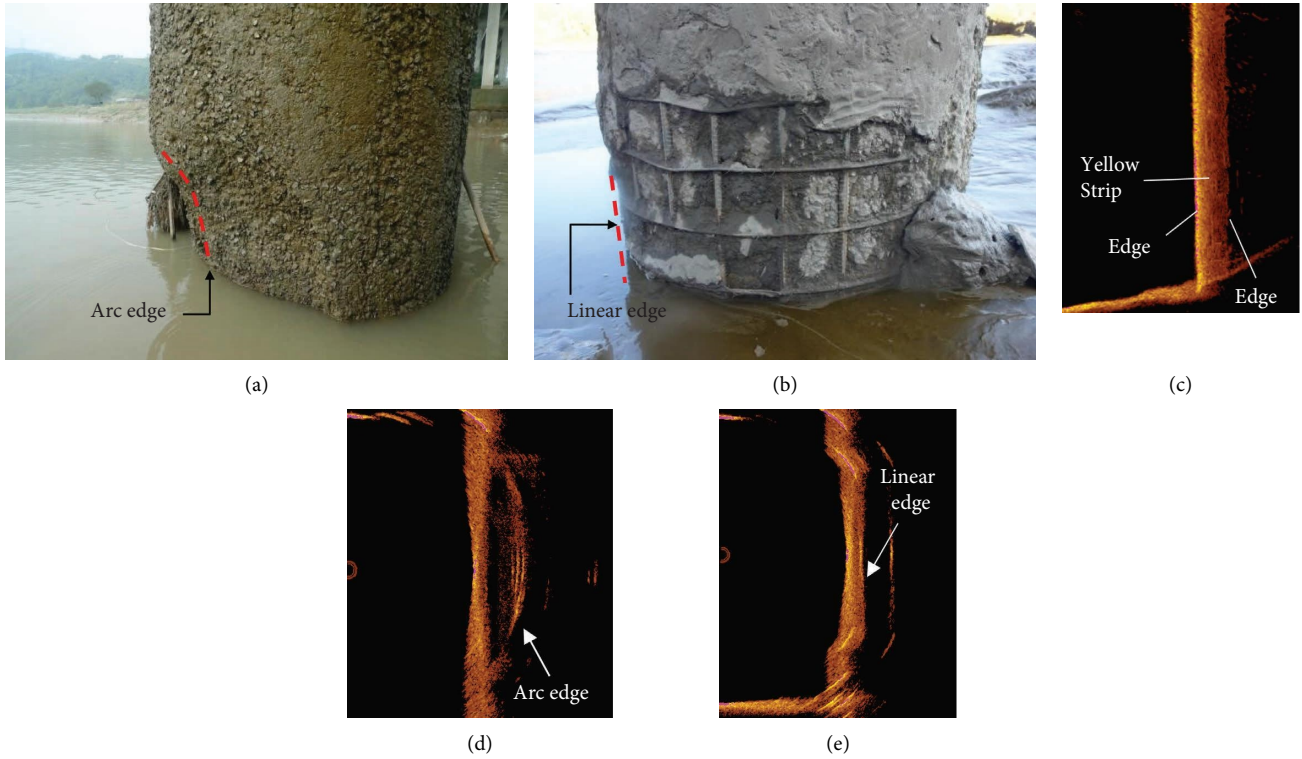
Photos and MSIS images of a cavity and a spalling on a pile surface. (a) A typical case of cavity [36]. (b) A typical case of spalling [36]. (c) An intact pile. (d) Cavity. (e) Spalling.
